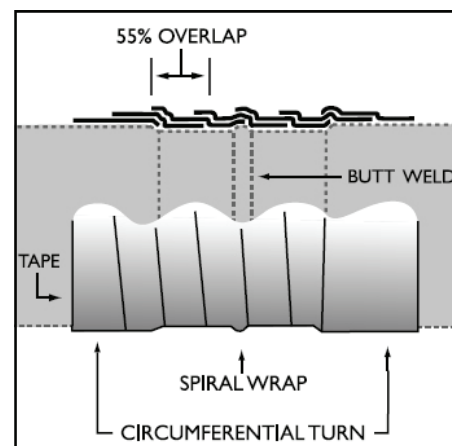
Butt weld and existing coating ready for over wrapping with tape. Note cutback of coating can be 75mm - 150mm either side of the weld except on FBE coated pipe.
